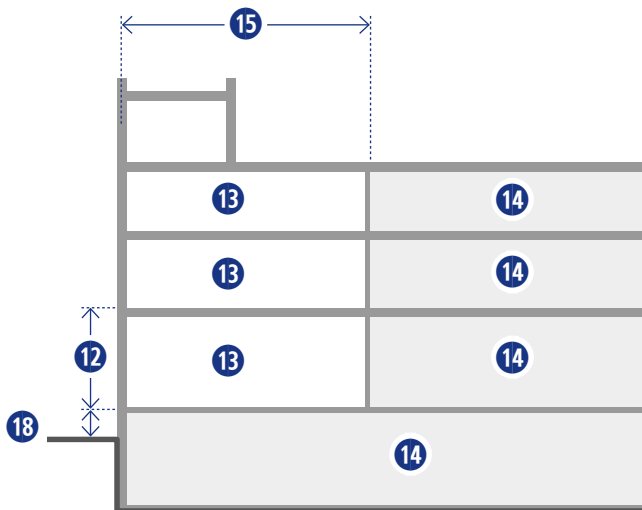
Civic Building: Floor-to-Floor Height & Use Requirements
